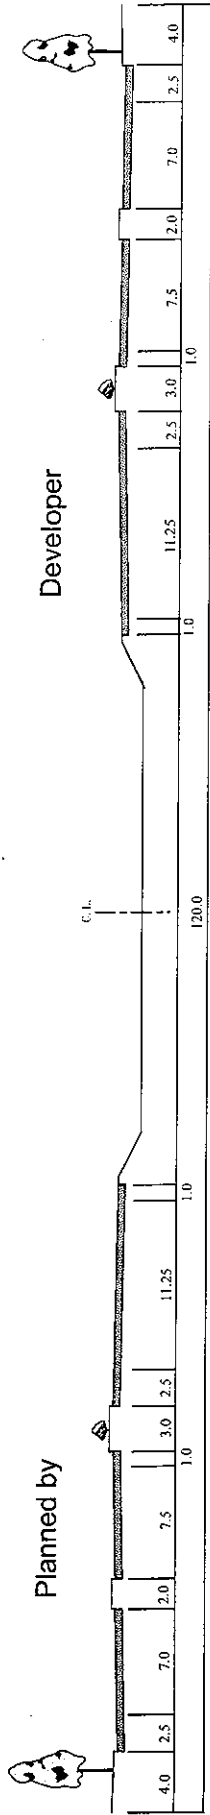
Typical Cross-section of South Section of Ring Road No.2
